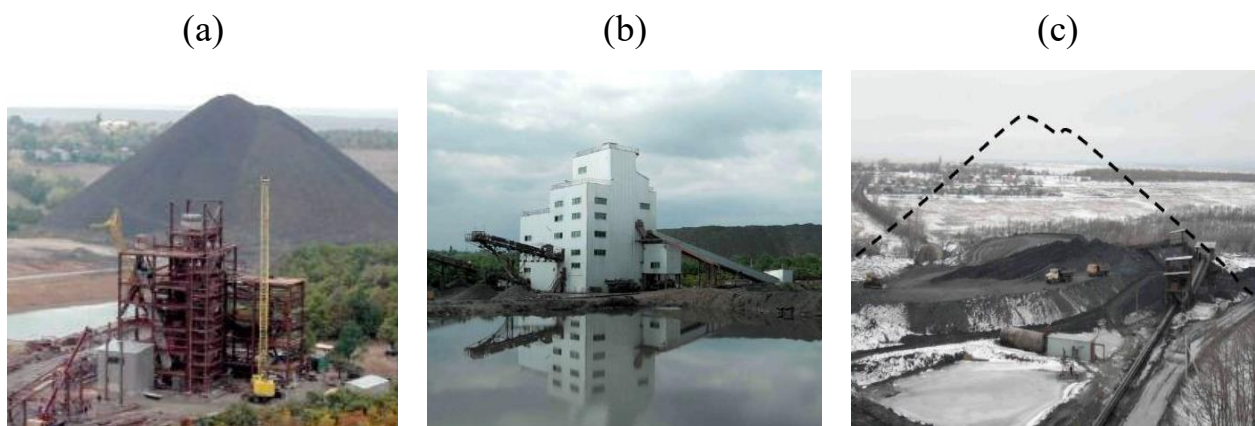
Beneficiation plant for processing dump waste rock mass: (a) the stage of construction and installation of the plant equipment; (b) view of the constructed plant module; (c) recycled dump and closed quarry filled with waste rock
